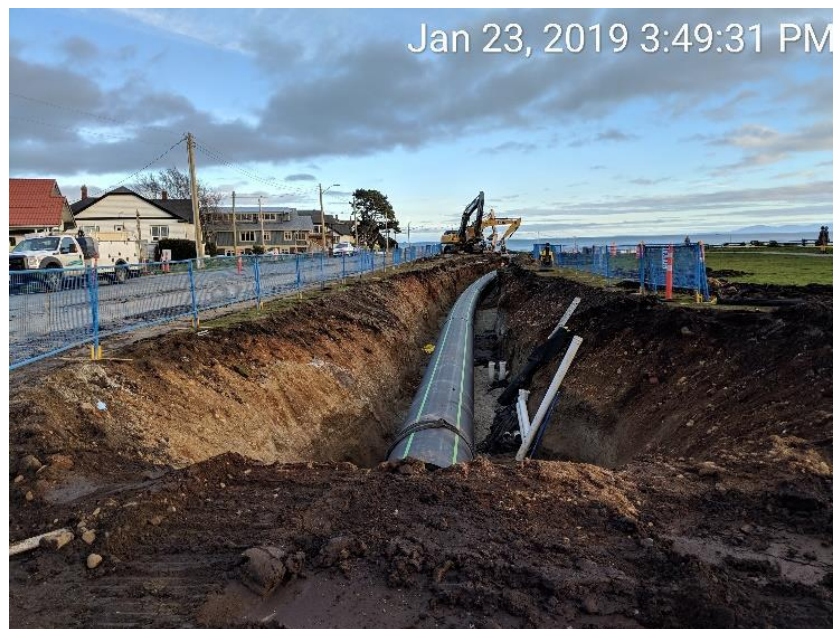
Clover Forcemain: forcemain trench installed at Clover Point end.
